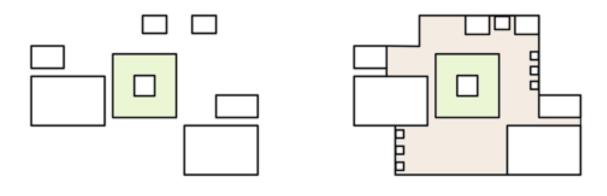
Site Plan – Visitor's Centre at Rameshwar Waterfall and Temple
